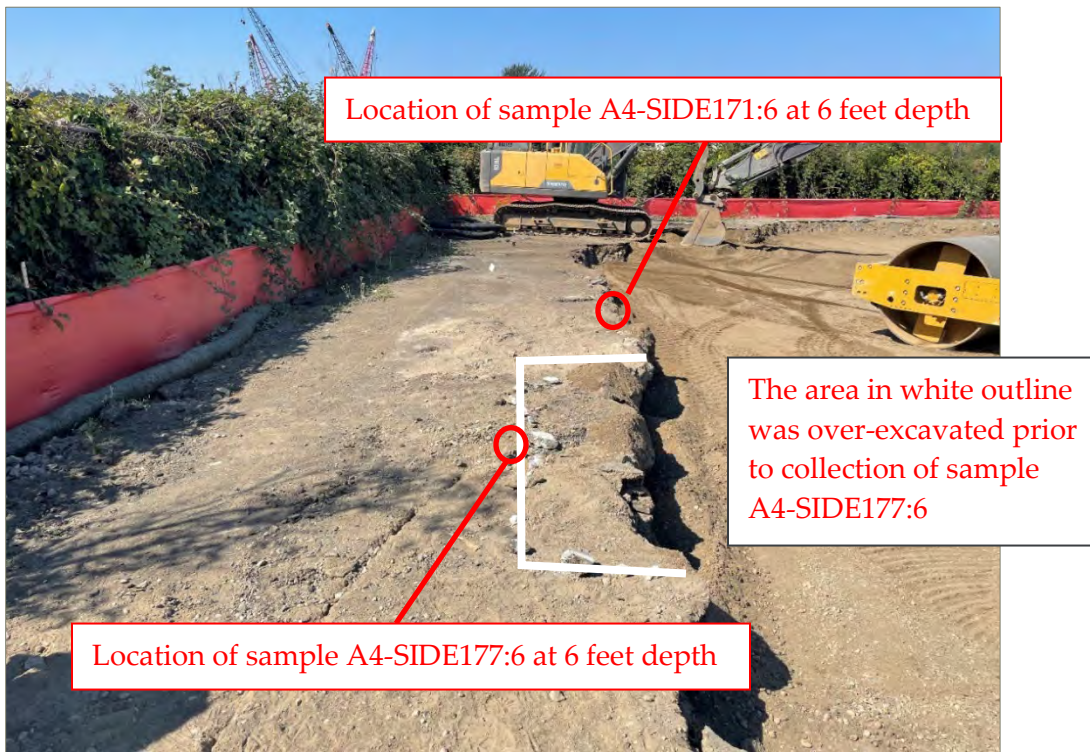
View of Proximity to Shoreline Berm Downslope at South Sidewall of Area 4. Photo taken on August 31, 2022. View direction is west.
